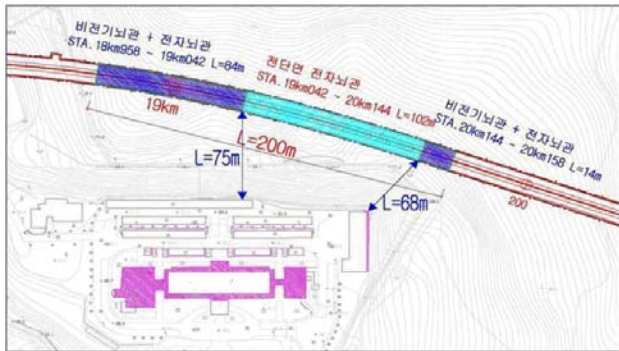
Plan view showing the sensitive 200m tunnel section and its proximity to the Precision Facility
